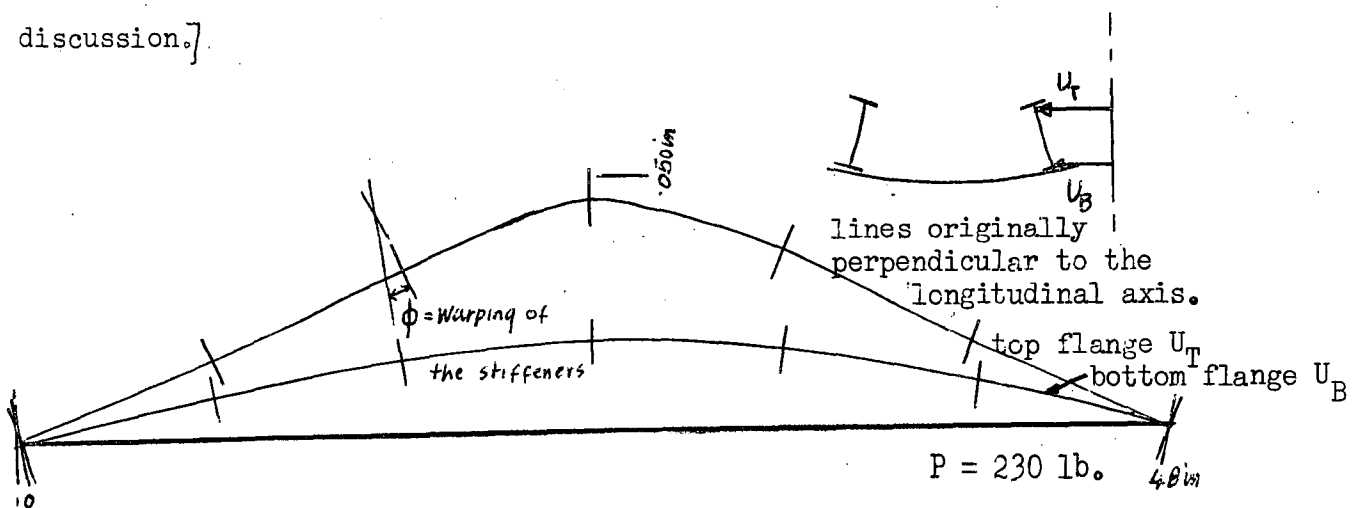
Deformed Bridge showing Warping of the Cross Section.
